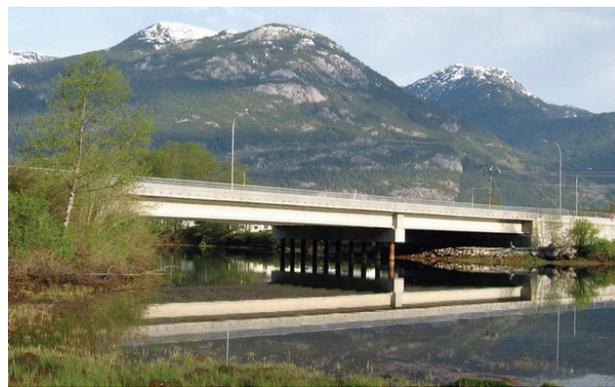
New Mamquam Blind Channel Bridge (Looking North-West)
